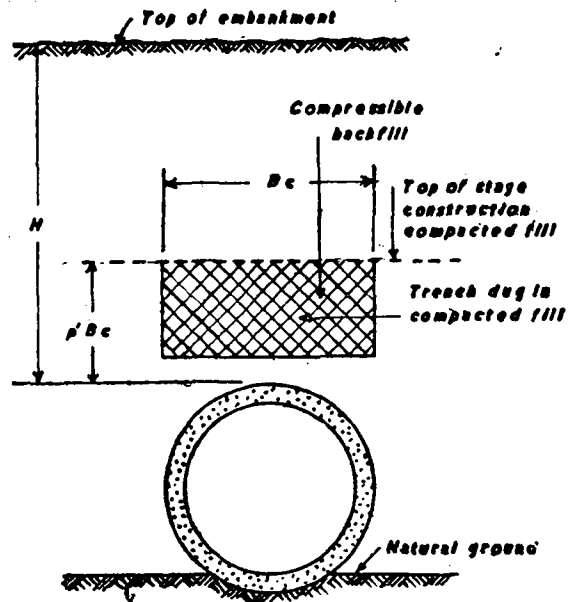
IMPERFECT TRENCH CONDUIT
